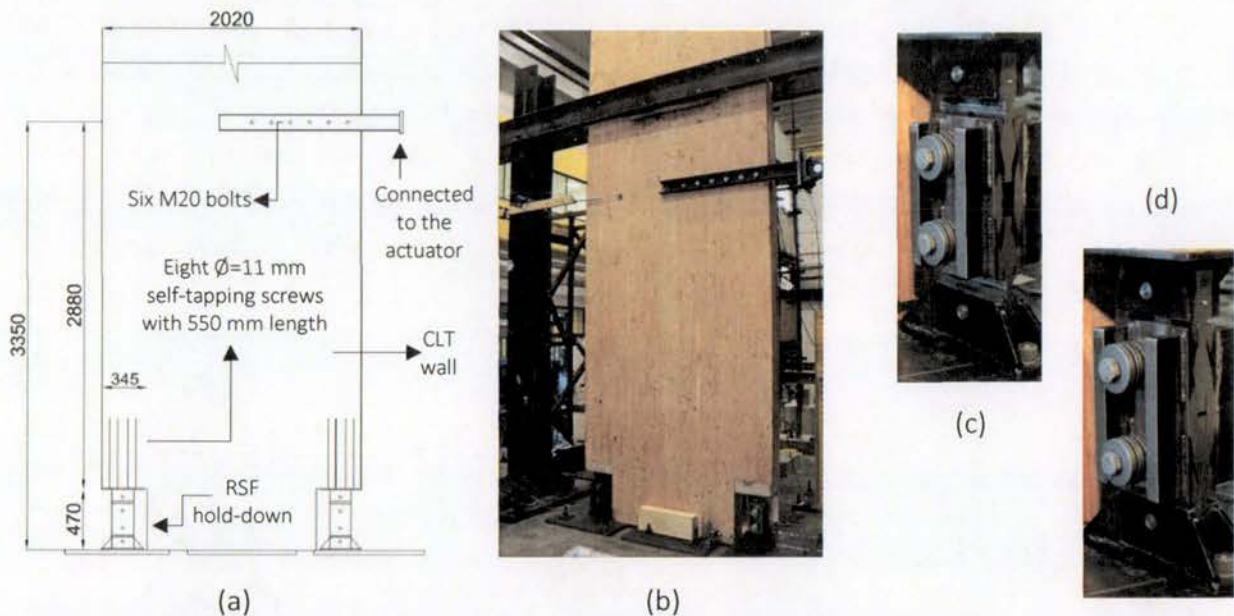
Experimental testing of rocking CLT wall with RSF joints: a) schematic test setup (dimensions are in mm) b) Test Specimen c) RSF joint deformation in tension d) RSF joint deformation in compression
